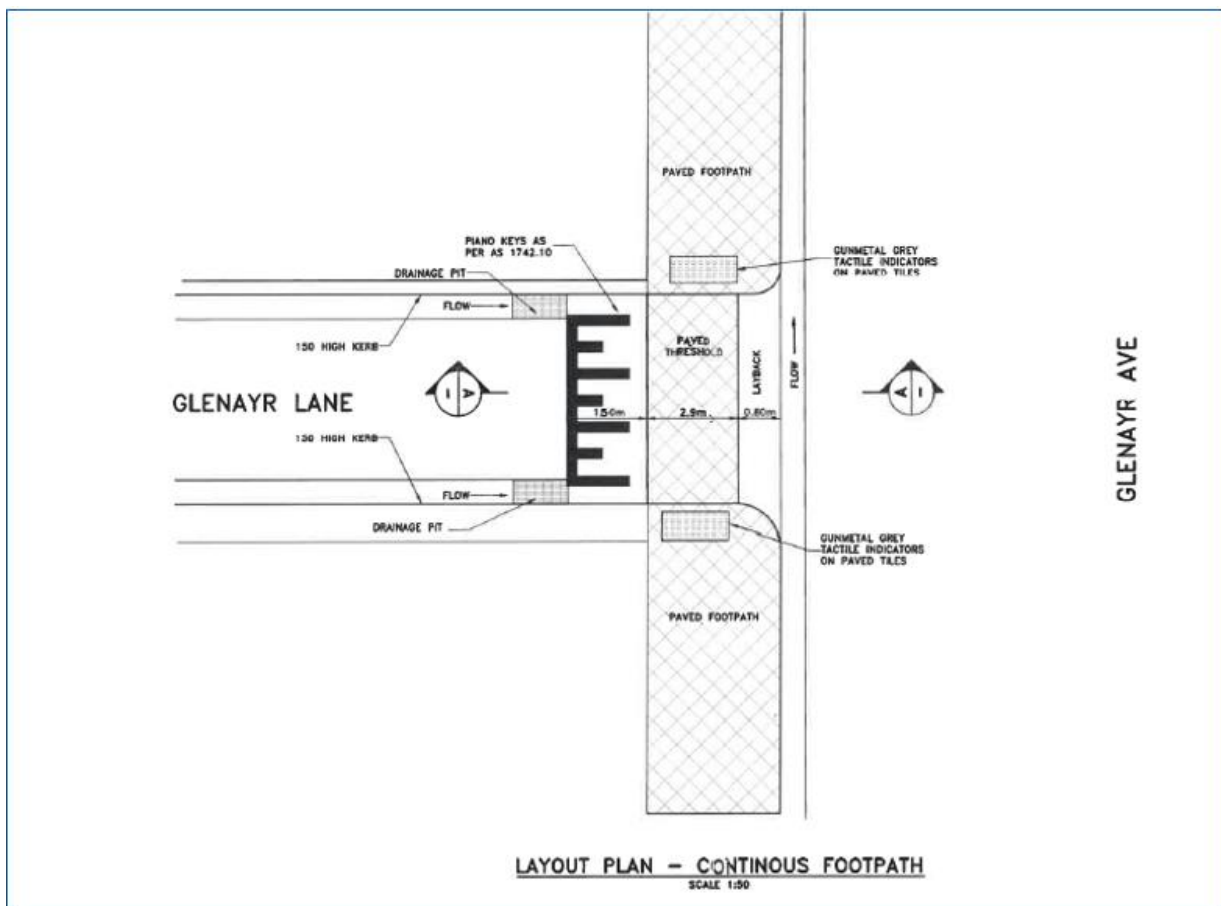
Glenayr Lane and Glenayr Avenue showing site of proposed treatment
